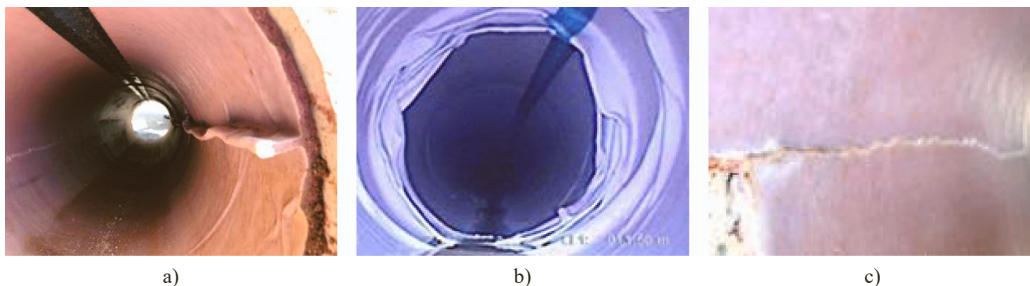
Example of defects resulting from improper CIPP installation. a) Longitudinal wrinkle. b) Hoop wrinkles. c) Longitudinal crack.
